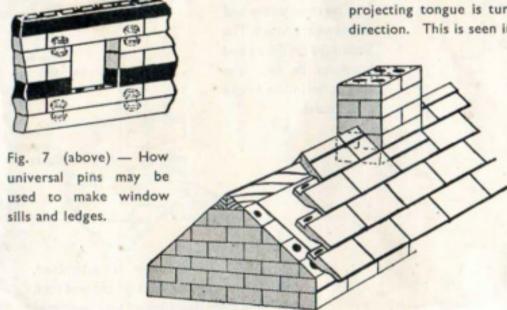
Shows the construction of a tiled roof with purlins to support the tiles. The roof is shown built round the chimney. The chimney is not built separately and placed on the roof after assembly, as is the case with whole roofs (as in Fig. 5), but is built up from the brickwork of the building.
